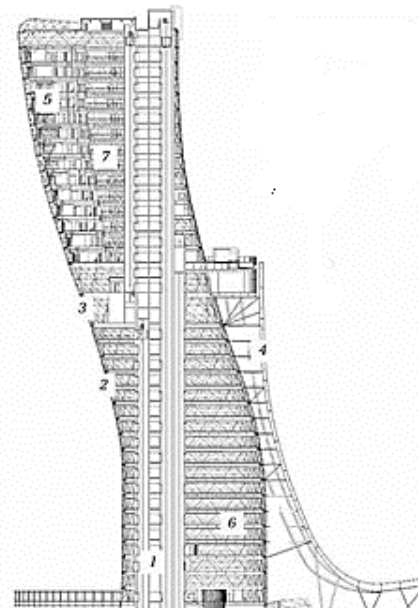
Section of Capital Gate: 1 – core; 2 – steel diagonal lattice; 3 – truss to resist overturning forces; 4 – sun protection device; 5 – hotel; 6 – offices; 7 – atriums
